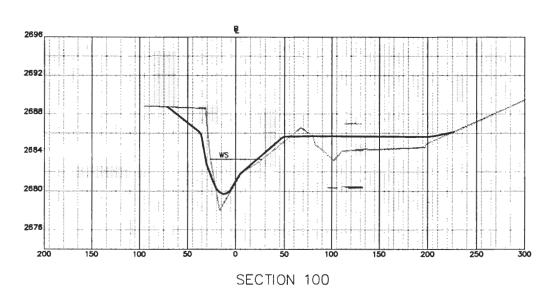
EXISTING AND PROPOSED CHANNEL CROSS-SECTIONS LITTLE WEISER RIVER SECTION 1135 & CHMHILL GLADHART LANE BRIDGE SECTION 14
